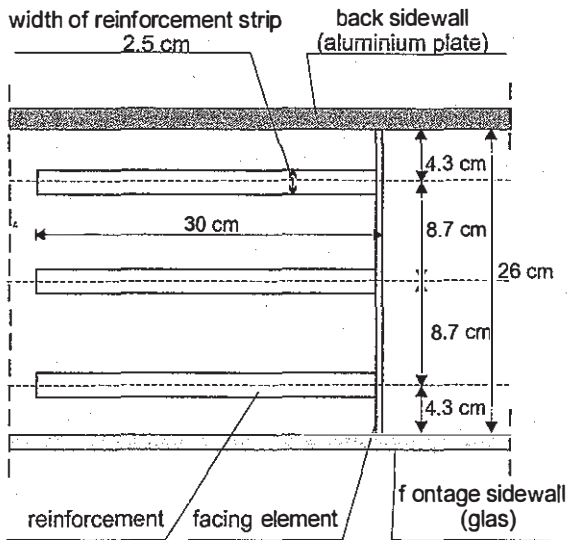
Arrangement of reinforcing strips in reinforcement layer.
